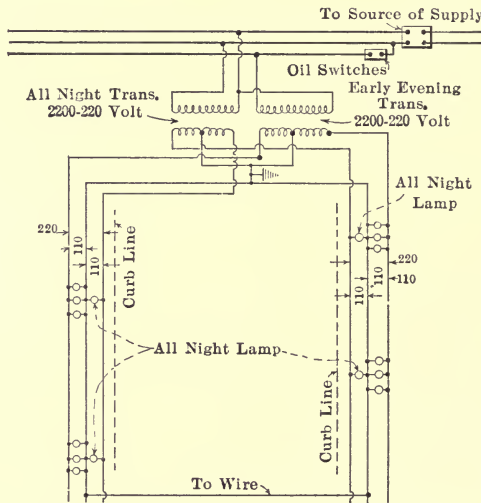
LIGHTING ONE LAMP ON FOUR-LAMP FIXTURES WITH THREE-WIRE SYSTEM.
